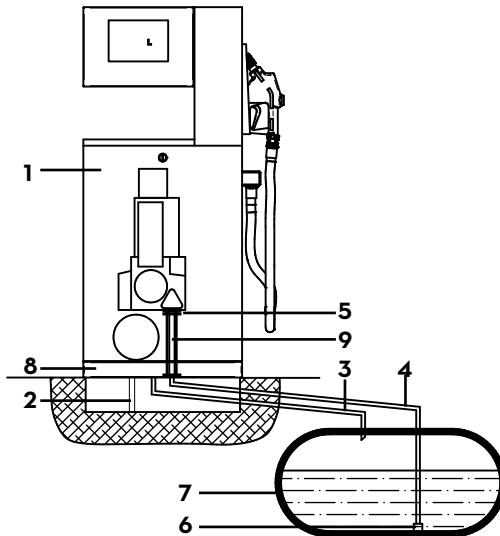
Example of connecting a dispenser with suction pumps to an underground tank
